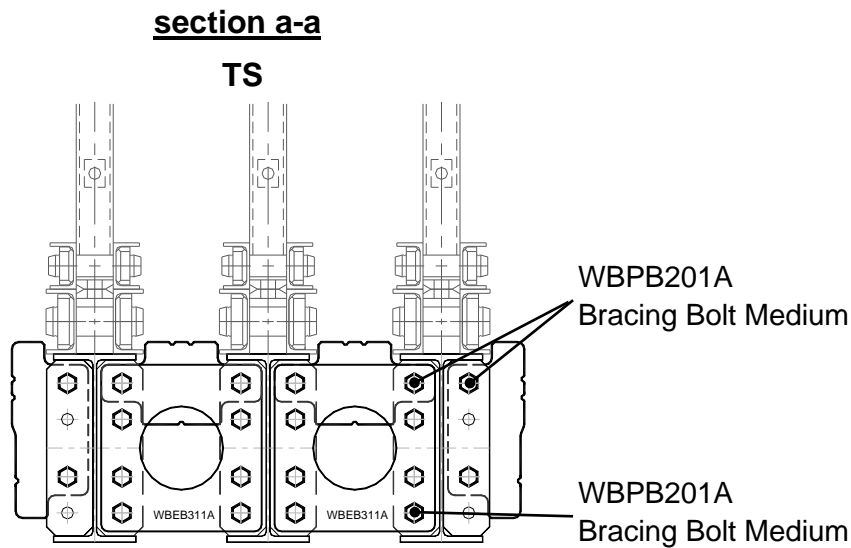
LOCATION OF LOCATORS FOR TS-CONSTRUCTION
